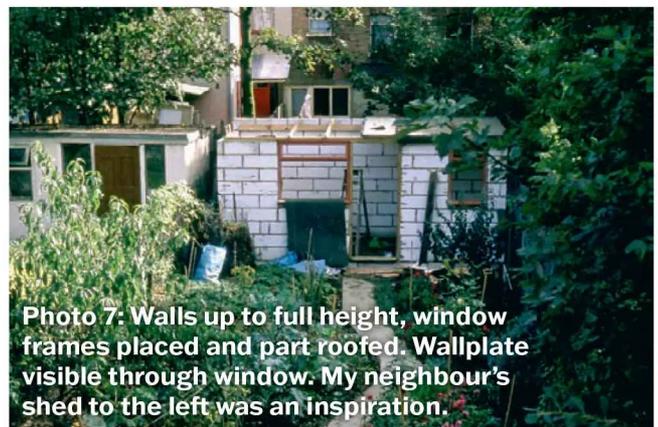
Walls up to full height, window frames placed and part roofed. Wallplate visible through window. My neighbour's shed to the left was an inspiration.
